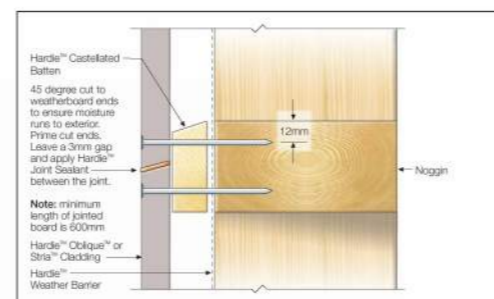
VERTICAL BUTT JOINT DETAIL
